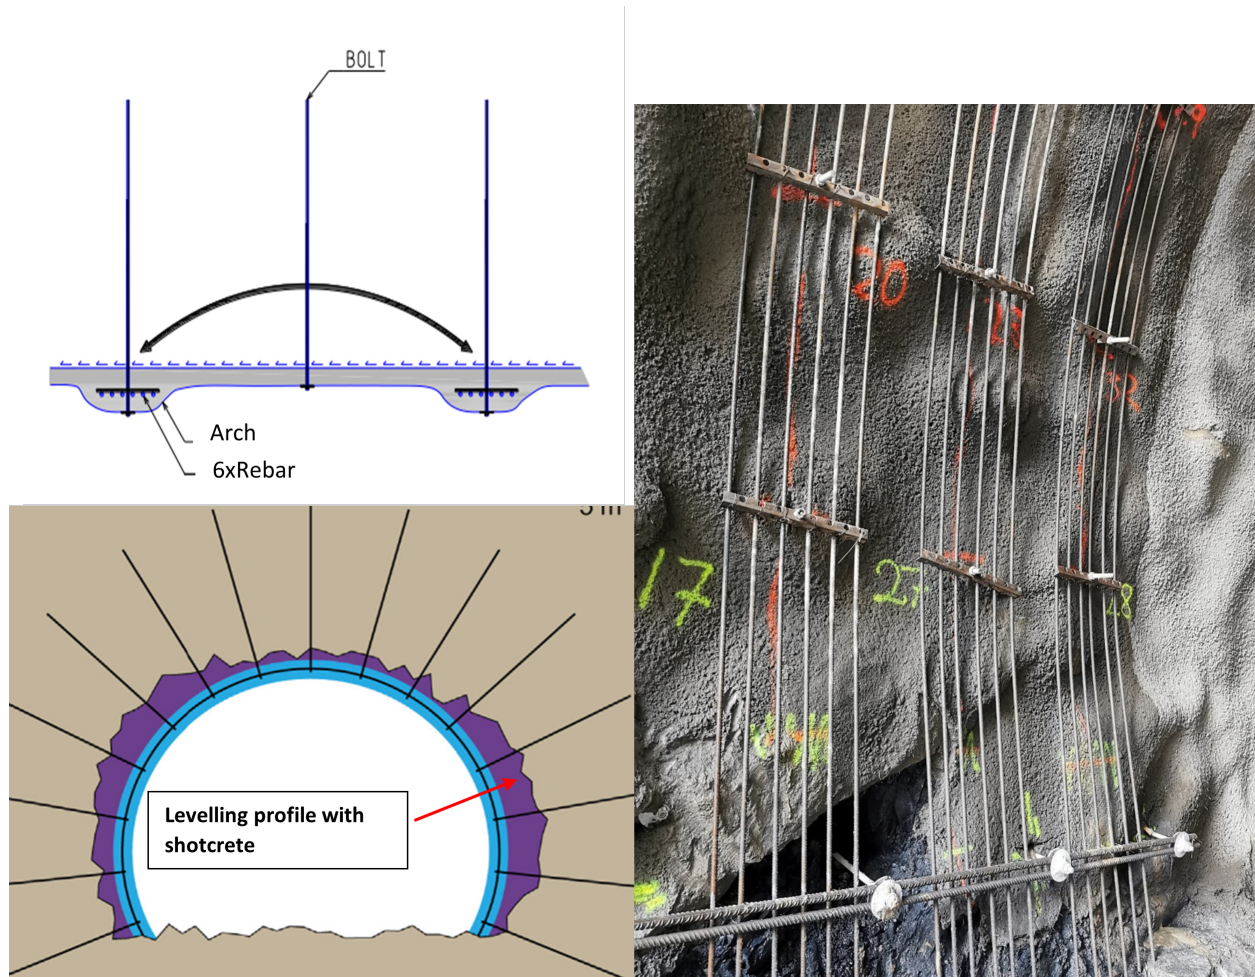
Upper left: principle of single-rebar RRS. From: NFF (2008). Lower left: Levelling of blasted-out tunnel profile. Modified after: Høien et al. (2019). Right: Ribs of rebars c/c 1m at tunnel cut section at Fornebubanen, ready for covering with shotcrete. Photo: Espen Torgersen.
